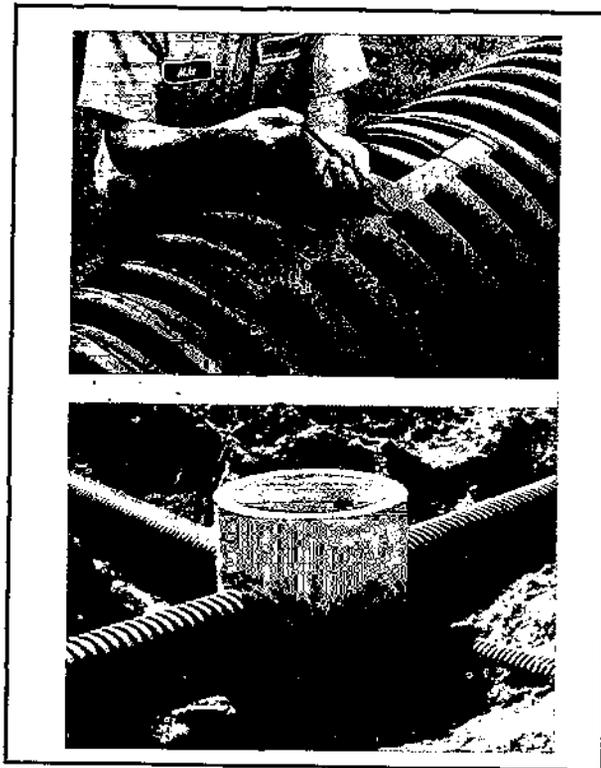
Photograph of HDPE Corrugated Pipe Being Coupled and After Installed.
